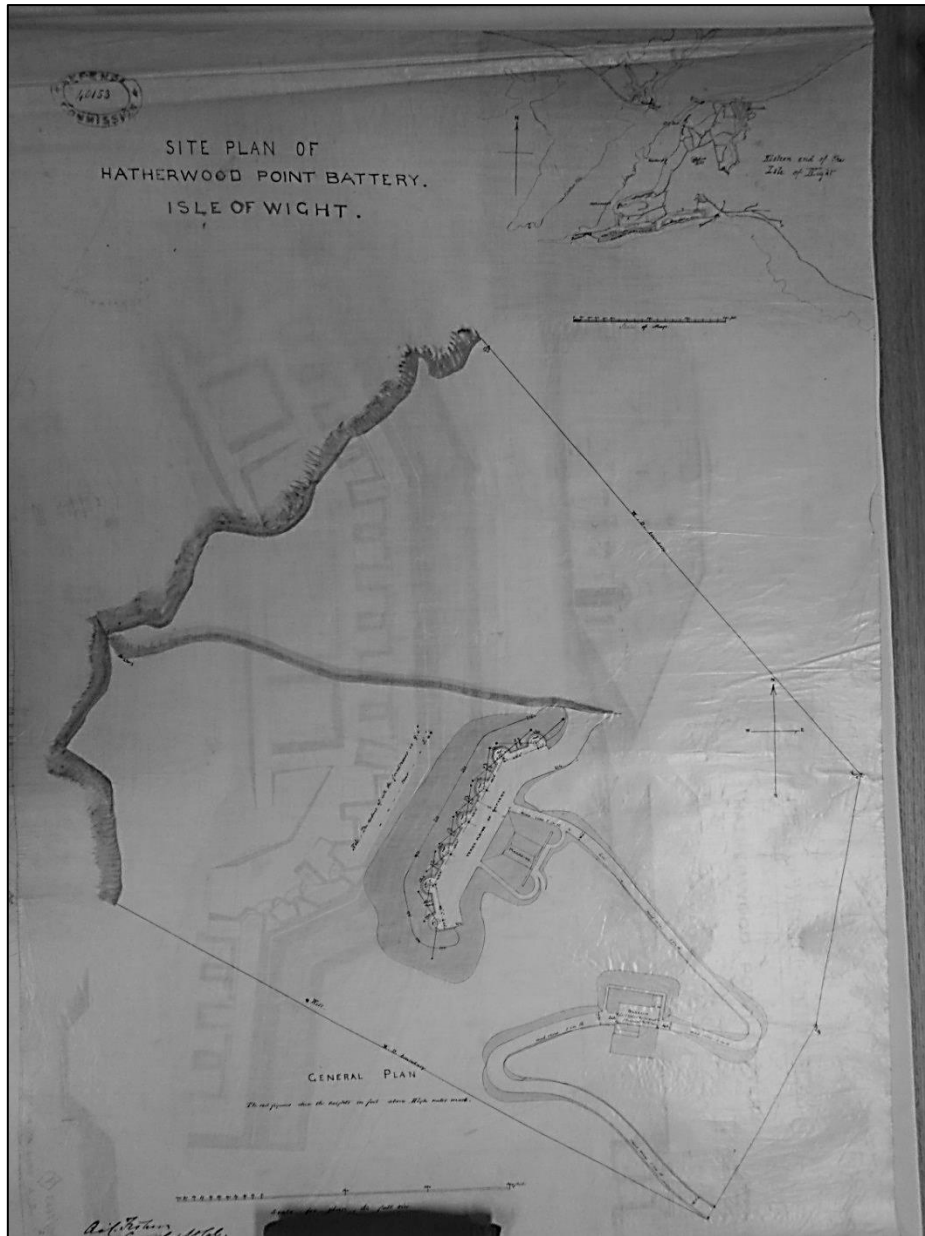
The original constructions plans of Hatherwood Battery, National Archived WO 78/2663/4.
